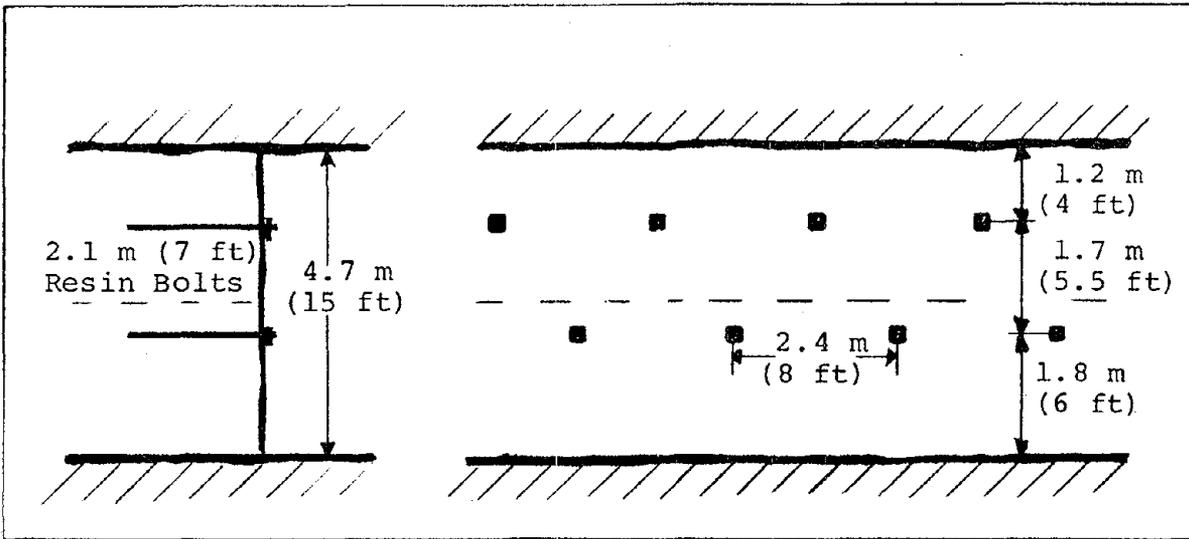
Face Bolting 15 ft. Seam with Resin Bolts
